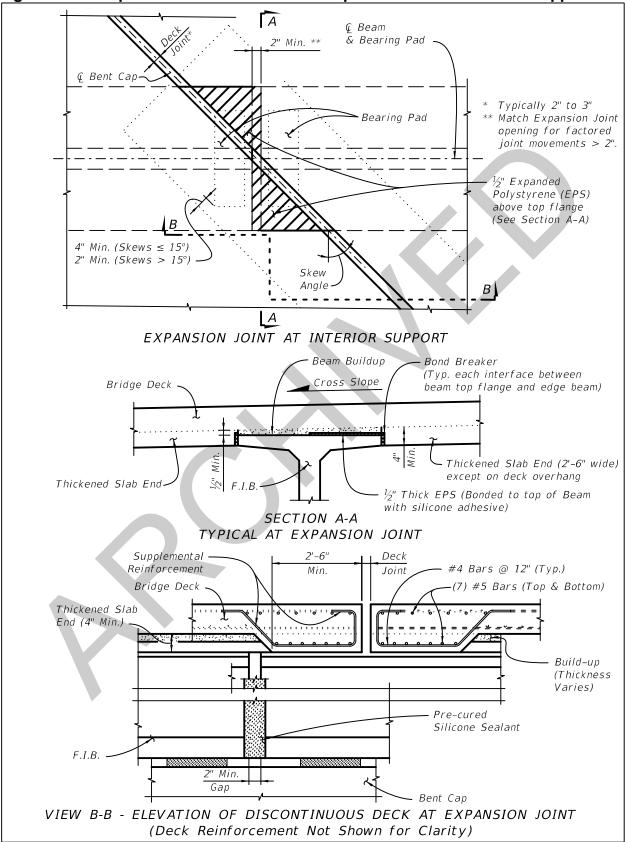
Squared Beam End Details – Expansion Joint at Interior Support
